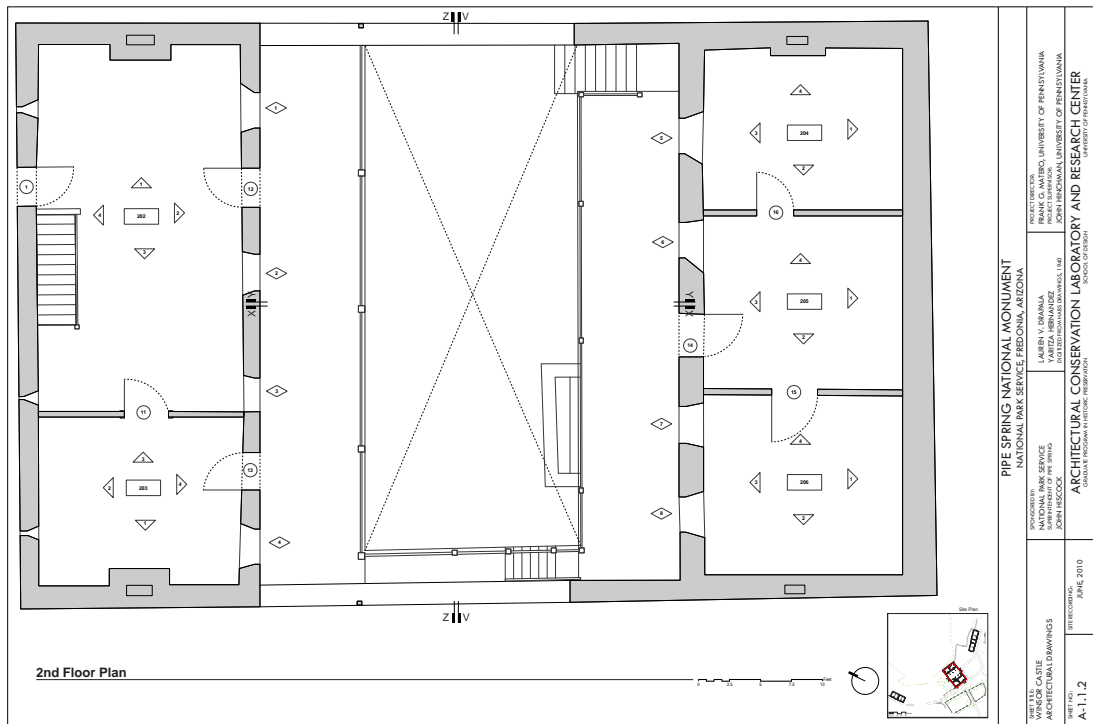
The Architectural Conservation Laboratory, “Second floor plan, Winsor Castle” (June 2010).
